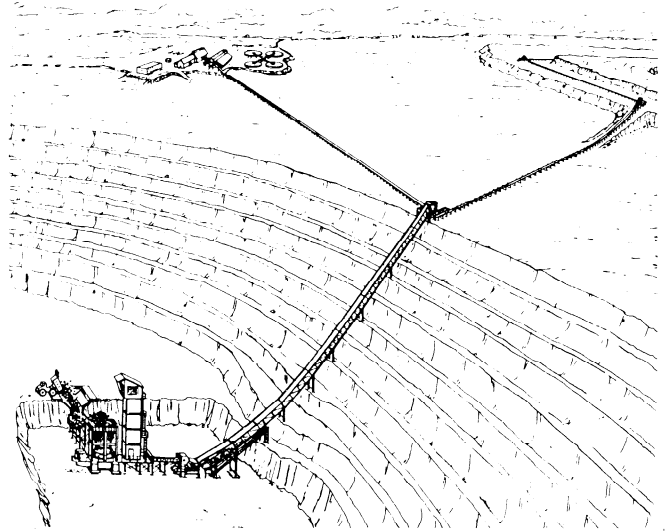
Steep-angle conveyor in pit using sandwich belt retainer construction (courtesy: Continental Conveyor Co.).
